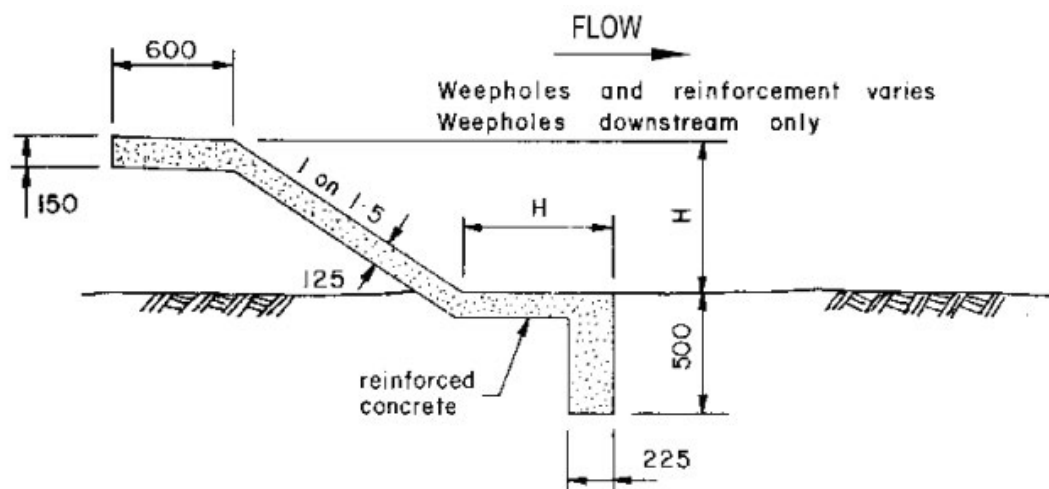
Type 1 concrete protection for floodway batters (Austroads 2013).
